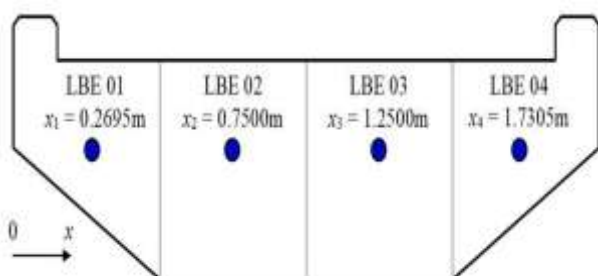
Detail of the division of the deck cross-section to define the stiffness and positions of the longitudinal beam elements
